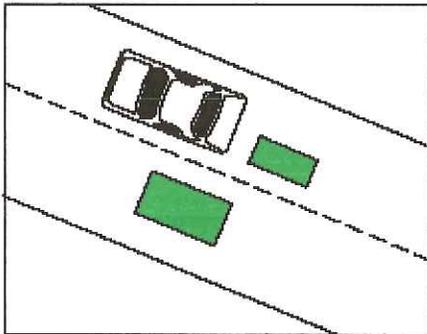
Surface tolerances for street repairs should meet the standard for new construction
